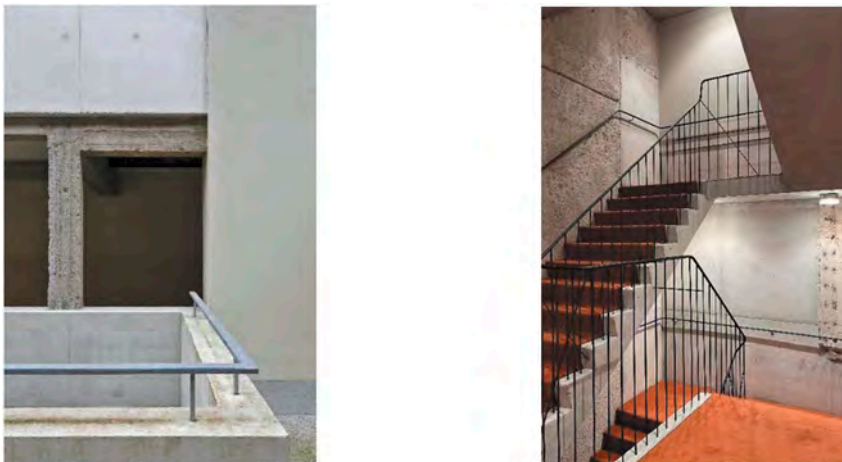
Left: A time composition of new concrete overtaking the old concrete; Right: The widened stairs display a patchwork of newly poured concrete parts amidst the locally cut-through original concrete structure. (©Filip Dujardin).
